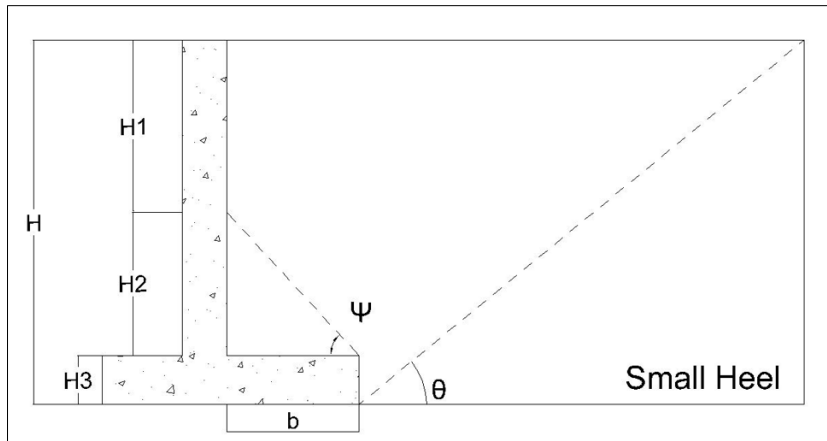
Failure surfaces behind a cantilever retaining wall with a small heel
